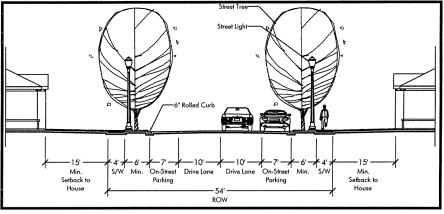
Neighborhood Street - Woodbridge by Del Webb, Section E
